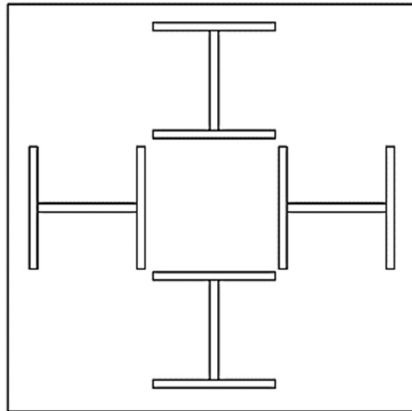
Diagram of a multi-profile composite reinforced concrete column of 4 I-beams.
